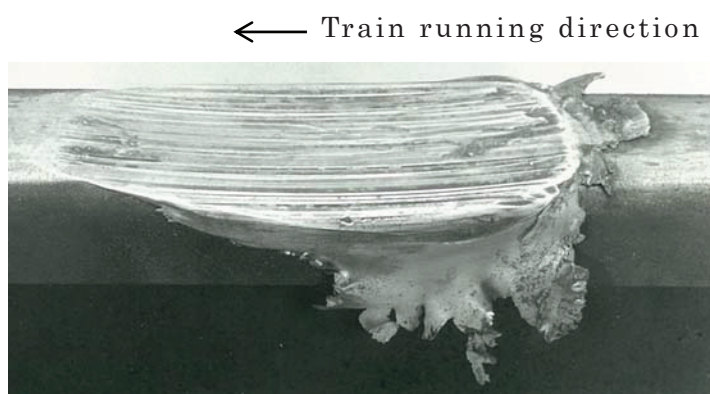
Appearance of the rail damage caused by the wheel burn of locomotive.
